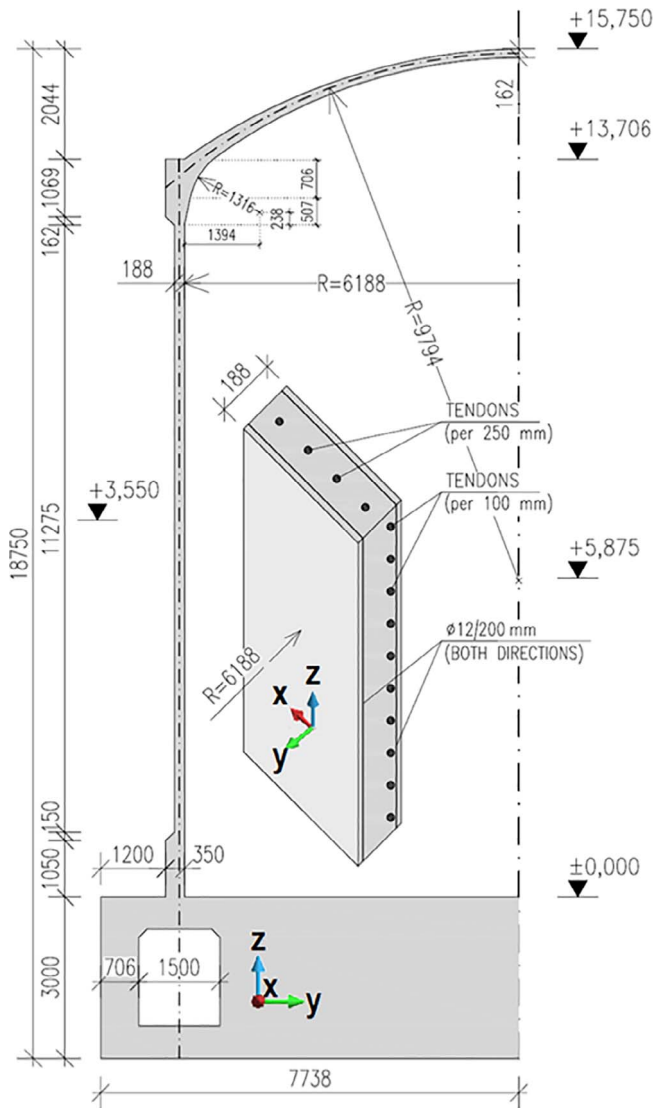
Vertical section of BARC containment and layout of tendons and main reinforcement bars in the typical area of BARC containment wall (the inset).
